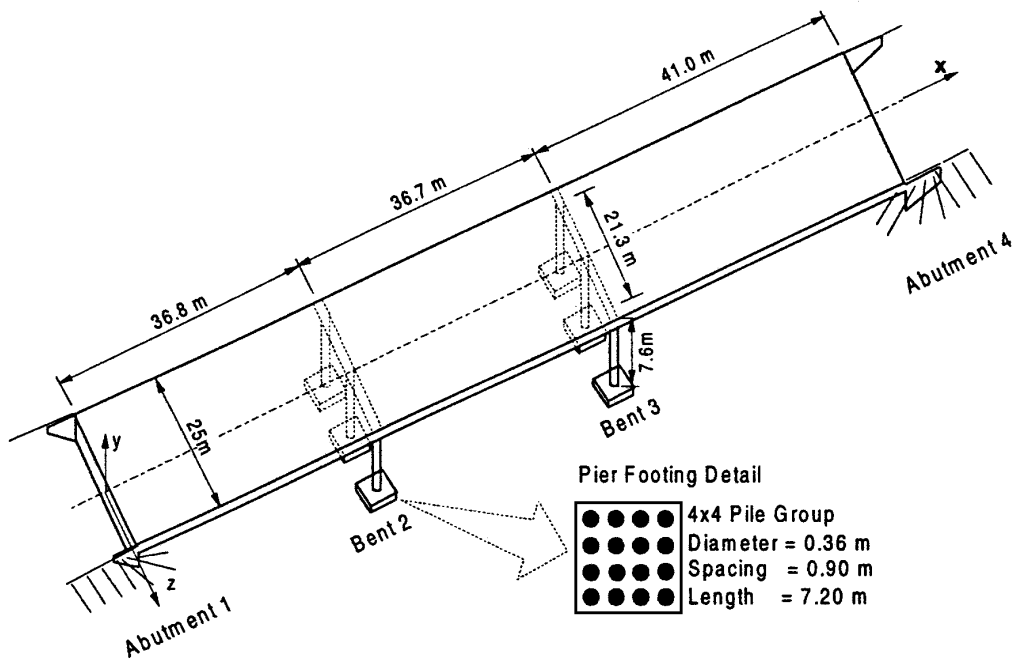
Three span box girder bridge on pile foundations (after (27)).
